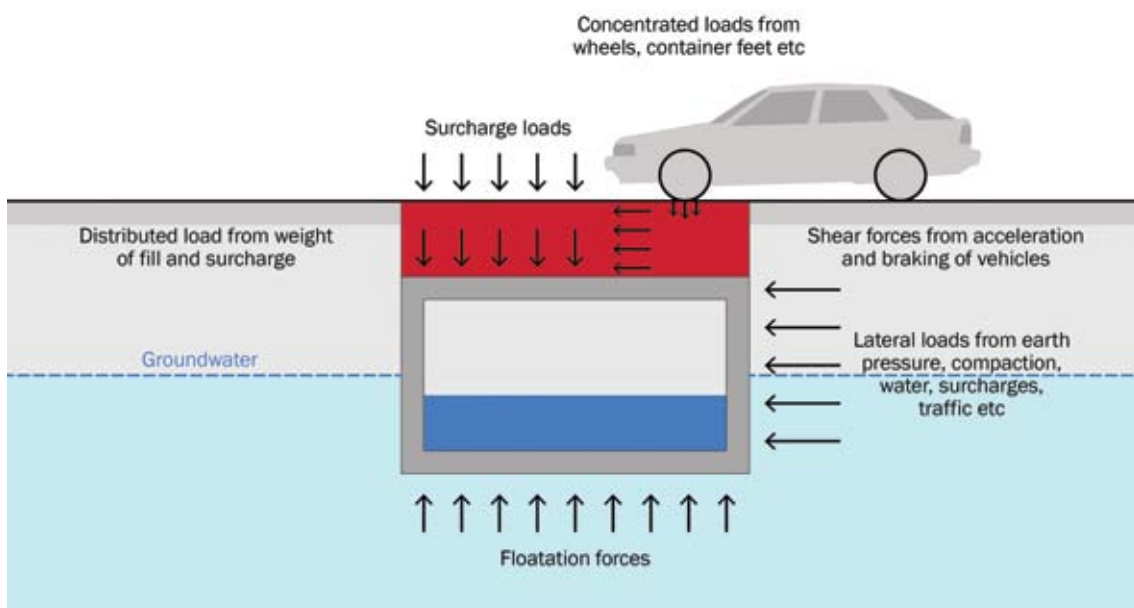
Typical loads to be considered in structural design of attenuation tanks
